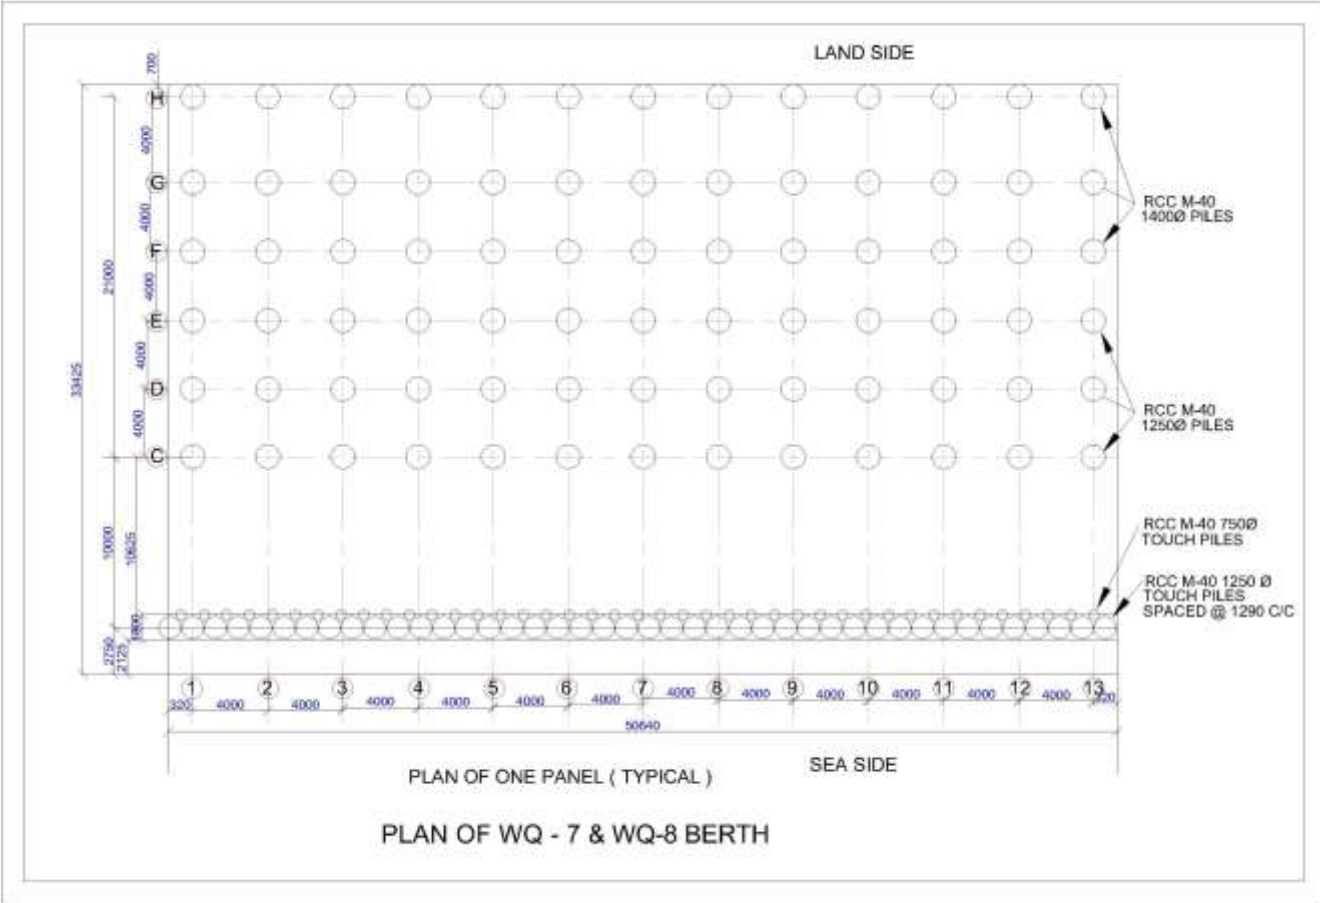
Layout Plan of the proposed WQ 7 and WQ 8 Berths
